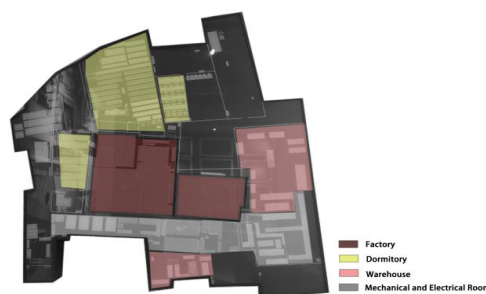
Initial construction floor plan of Xi’an Dahua Yarn Factory (drawn based on materials)
